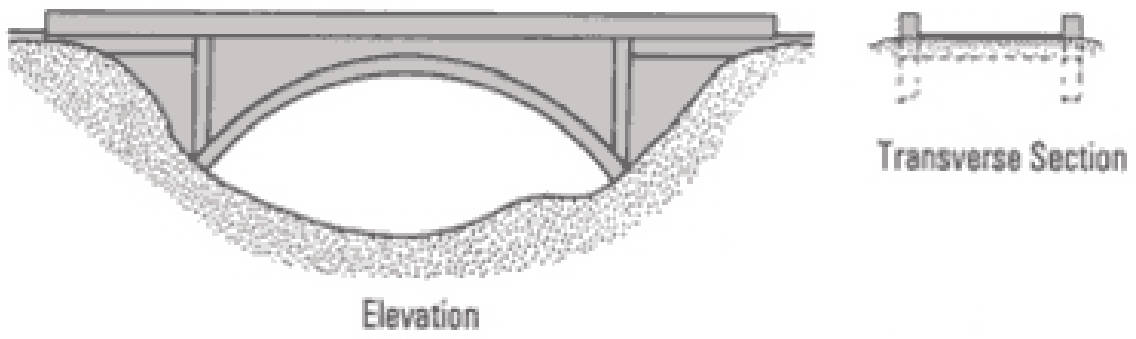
Closed Spandrel Arch, Source: Historic Bridge Foundation
